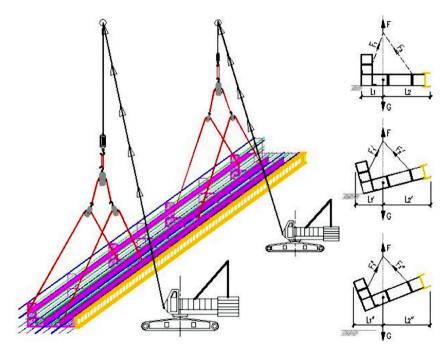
Lifting of L-shaped reinforcement cage 图 15. L 型钢筋笼吊装
